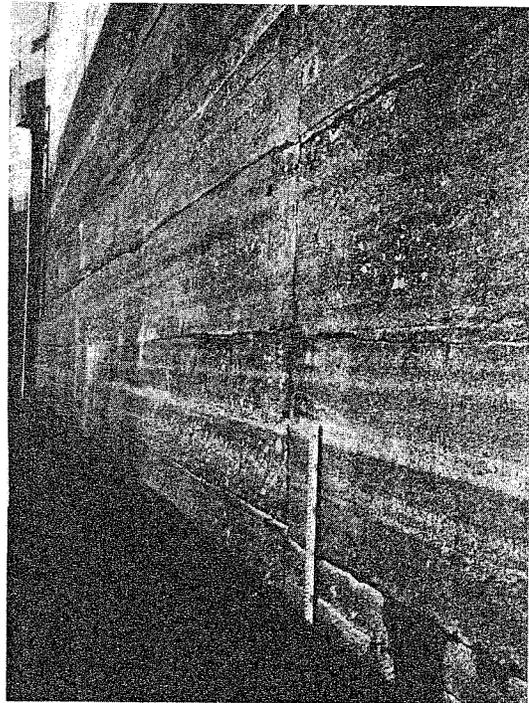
Upstream face of dam showing horizontal lift joints and vertical construction joints between blocks
